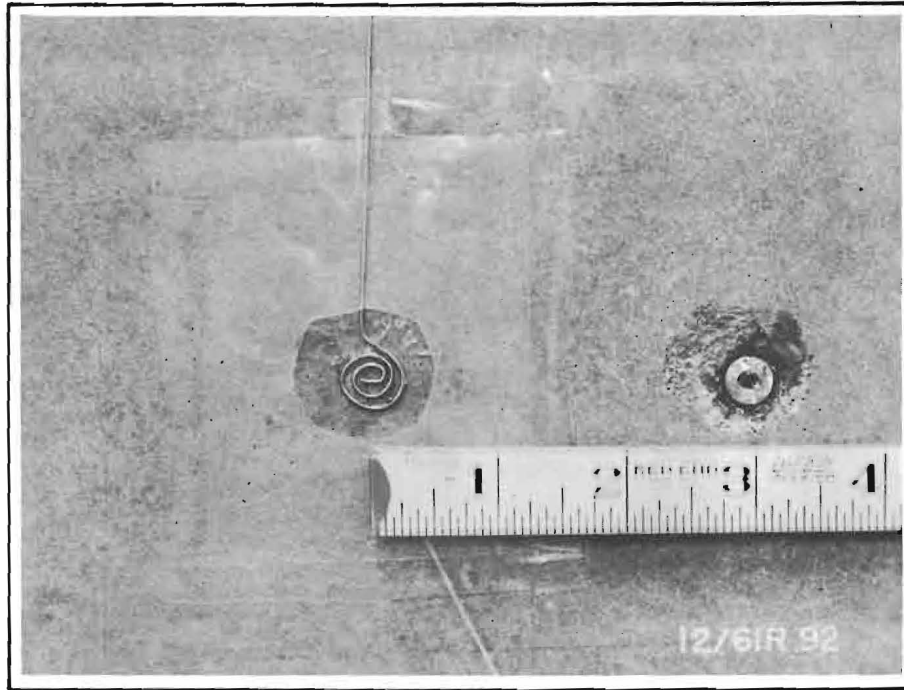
Close-up view of the wire coil portion of the pavement-subgrade separation gage, on the left; and the threaded brass fitting for attaching the deflection gage reference rods, on the right.
